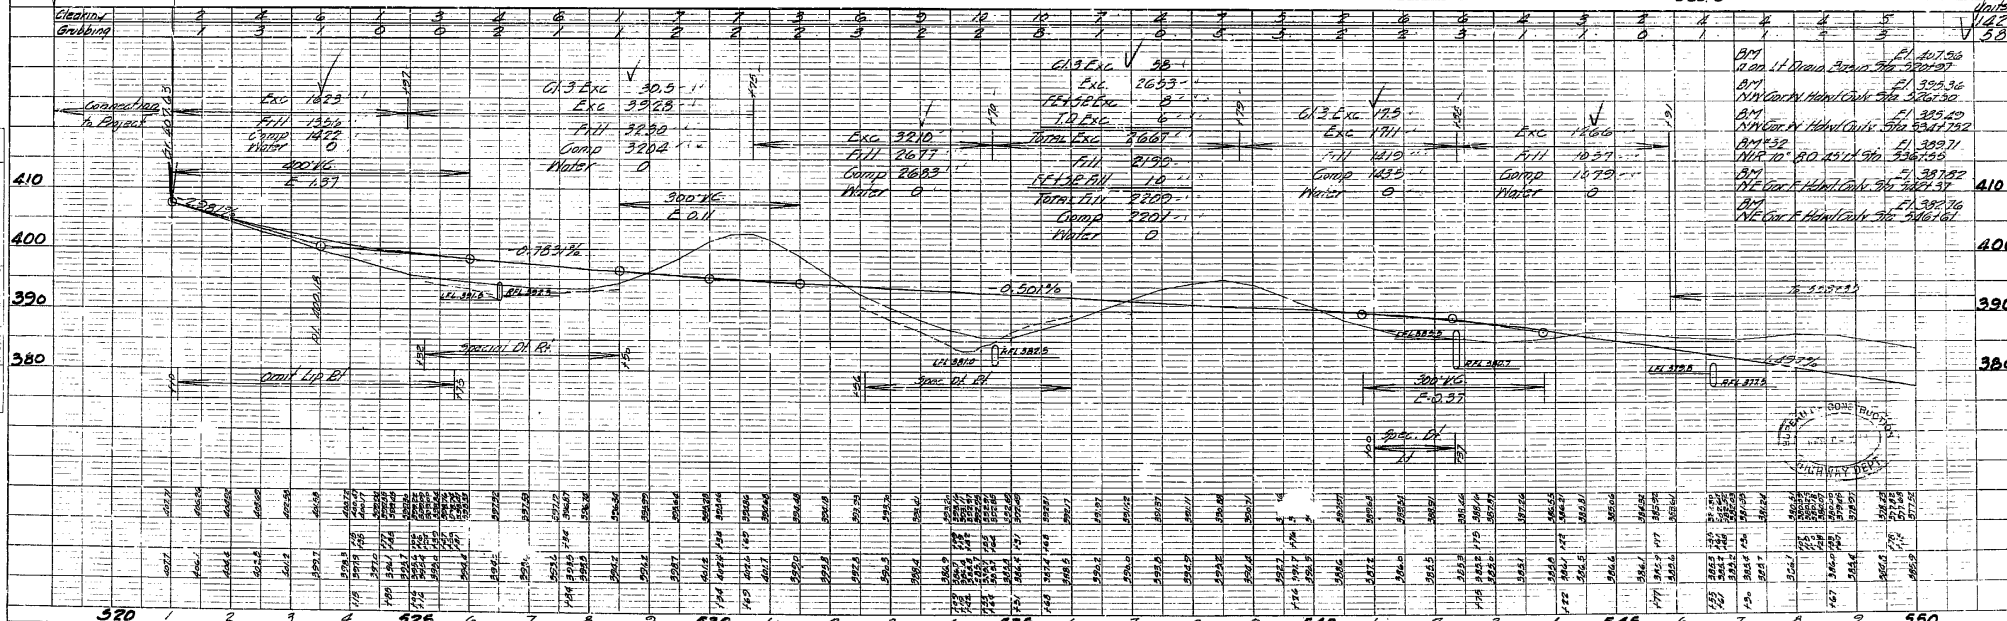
PLAN - PROFILE OF F. C. S. STANDARDS
